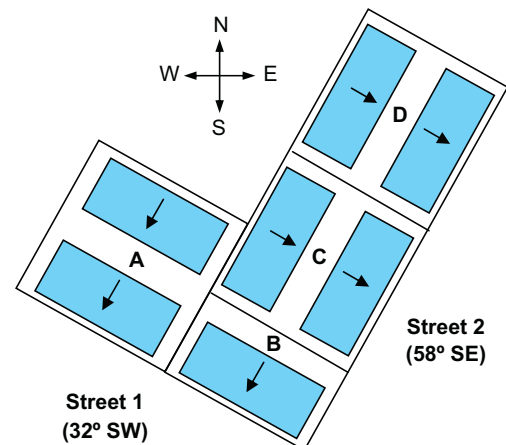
Plan view of the buildings and space available on the flat roof for installing solar collectors.
